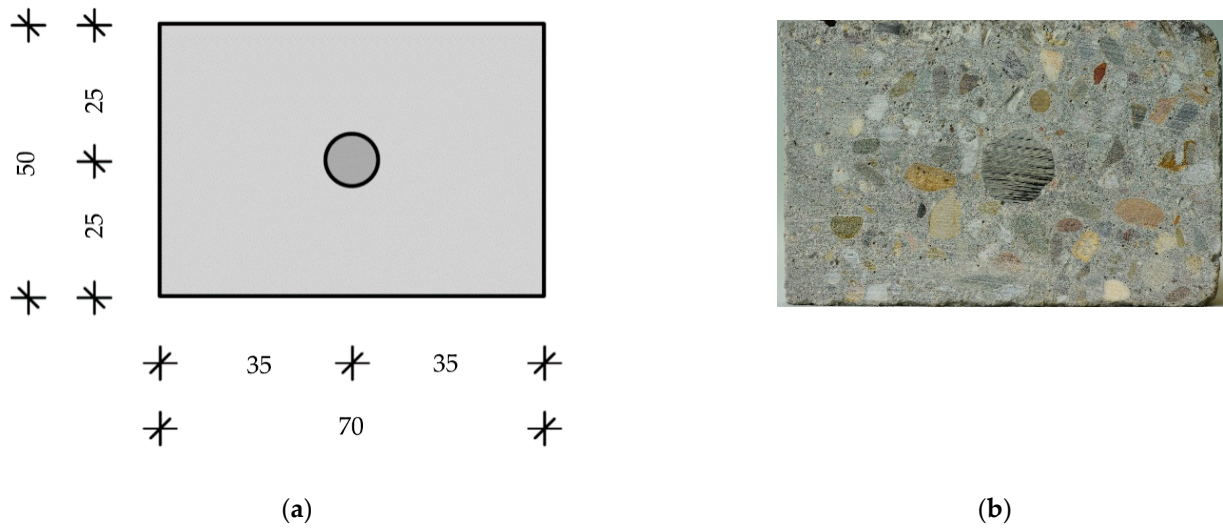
Specimen cross-sections: (a) schematic; (b) the cut-specimen after testing (anchorage area).
